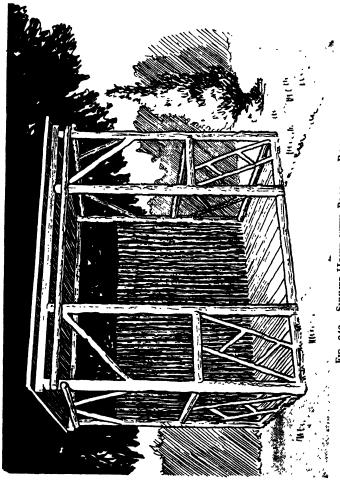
SUMMER-HOUSE WITH BOARDED ROOF.
